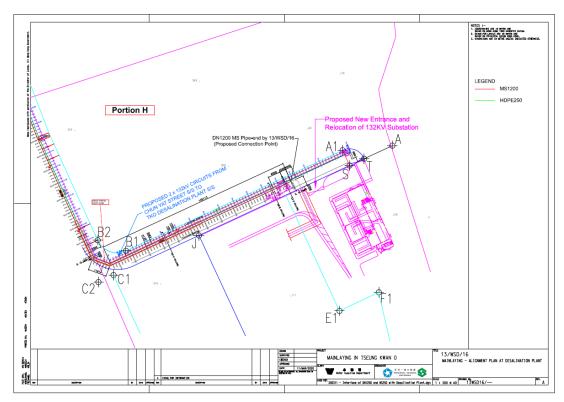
Location Plan for CH.CT 0+07 - 2+58
